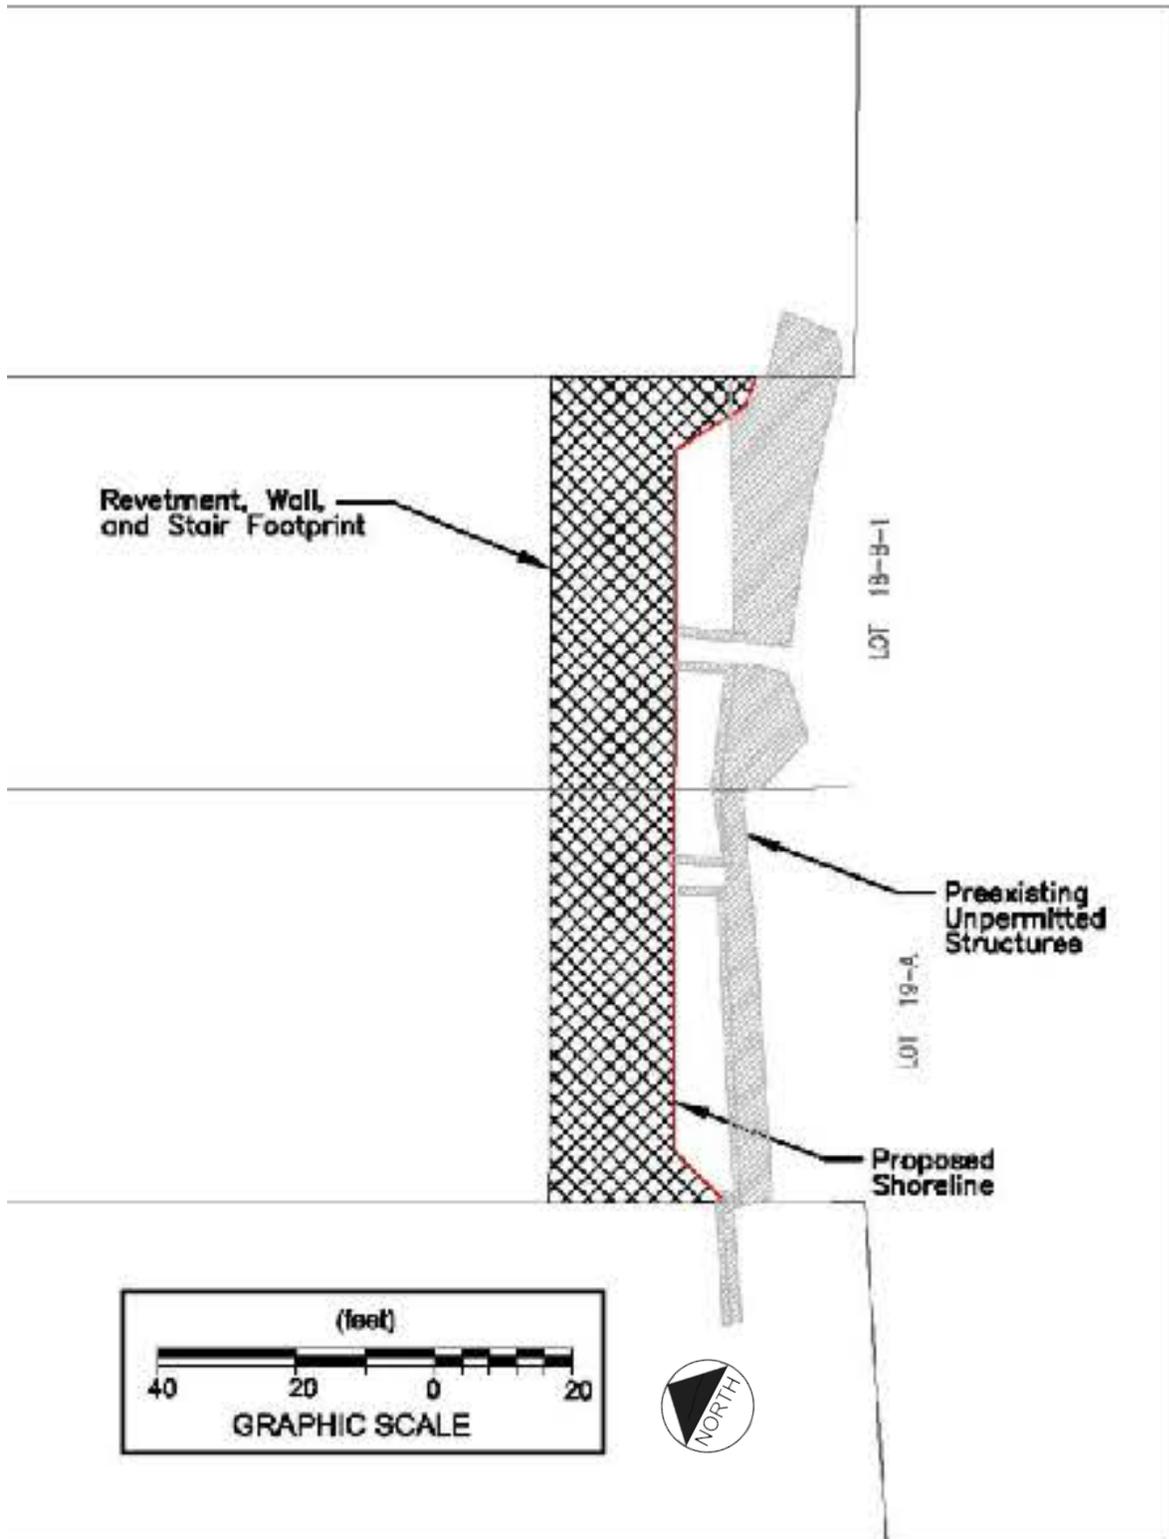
SITE PLAN PROPOSED REVETMENT FOOTPRINT
